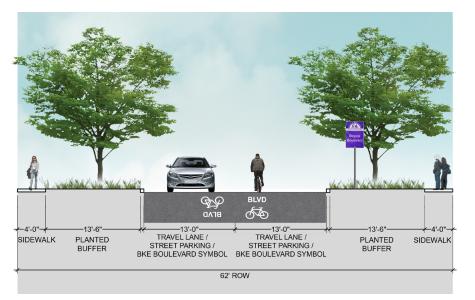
Proposed Local Street With Shared On-Street Bikeways - Dixie Drive from Telephone Rod to IH-45
